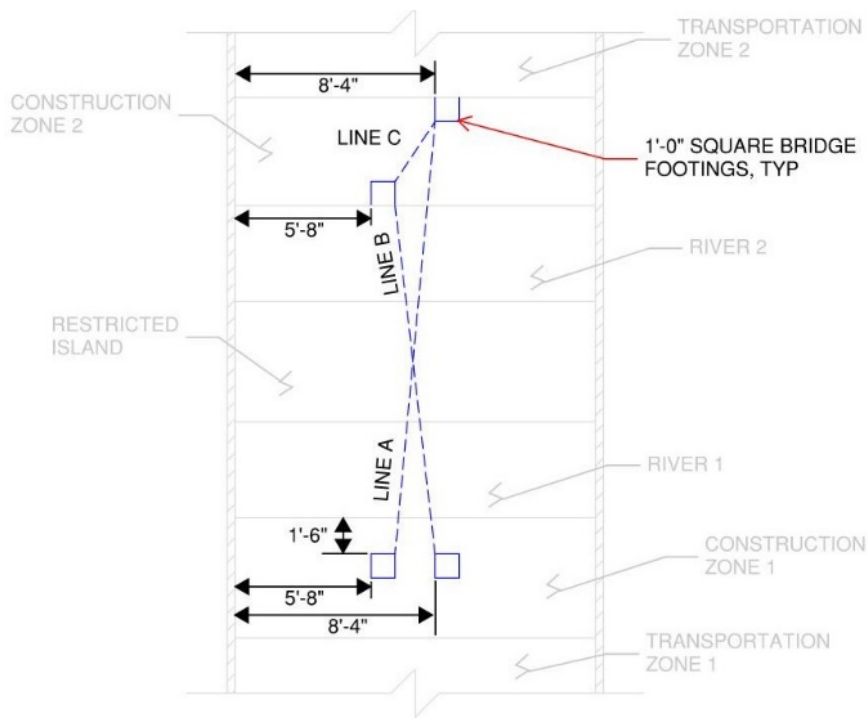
BRIDGE FOOTING BOUNDARIES
